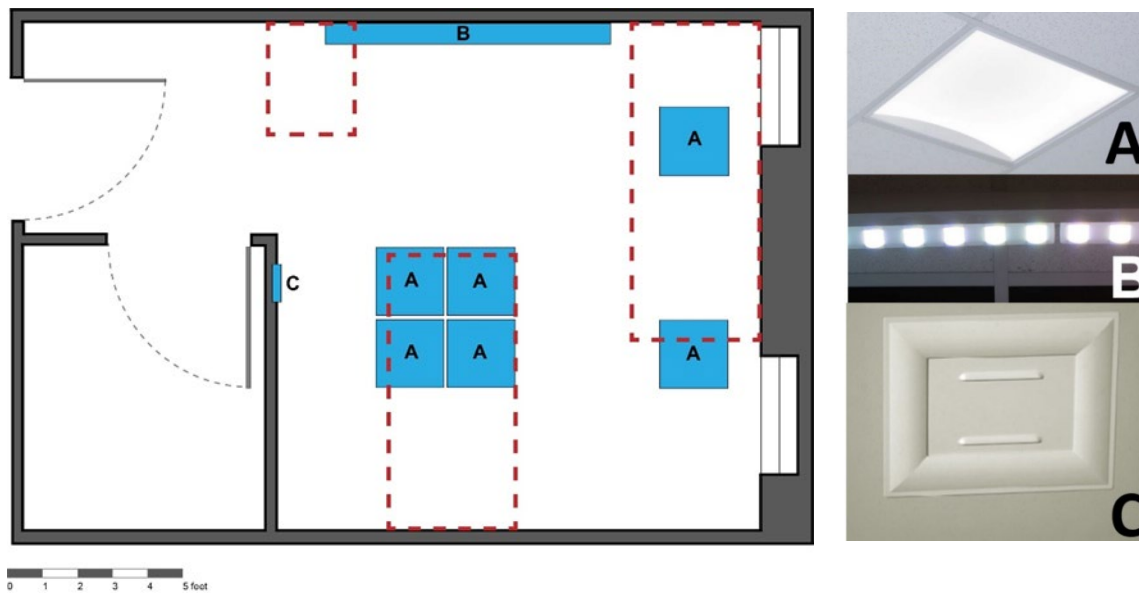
Reflected ceiling plan detailing the layout of luminaires.
